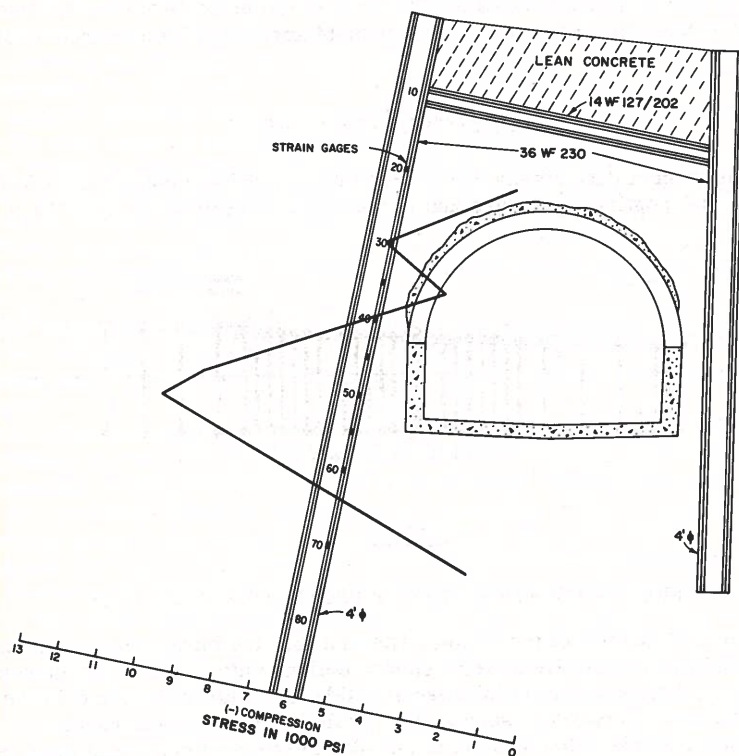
FLEXURAL STRESS—A PILE NO. 16.4, SR-4 STRAIN GAGES
